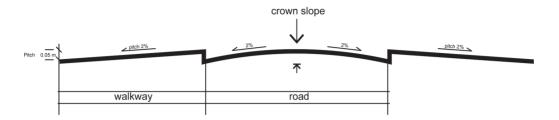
The cross section showing the crown slope of a road and the pitch tilt or the cross slope of a walkway
